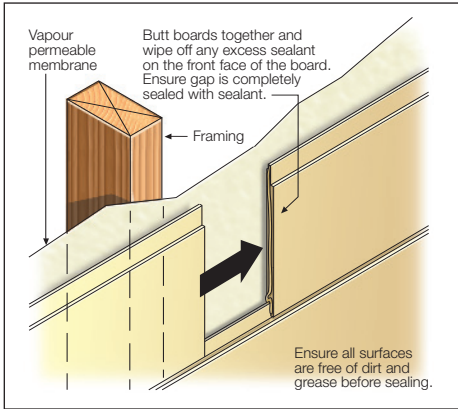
OFF STUD JOINTING (STEP 2/2)
